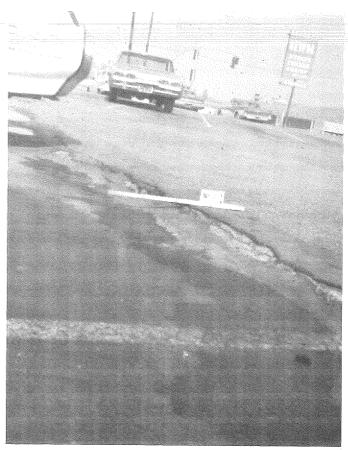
Earthcrack 2. Looking north across restaurant parking lot near southwest corner of Stocker Street and La Brea Avenue. Maximum vertical displacement 2 inches. Opening 1 inch.
